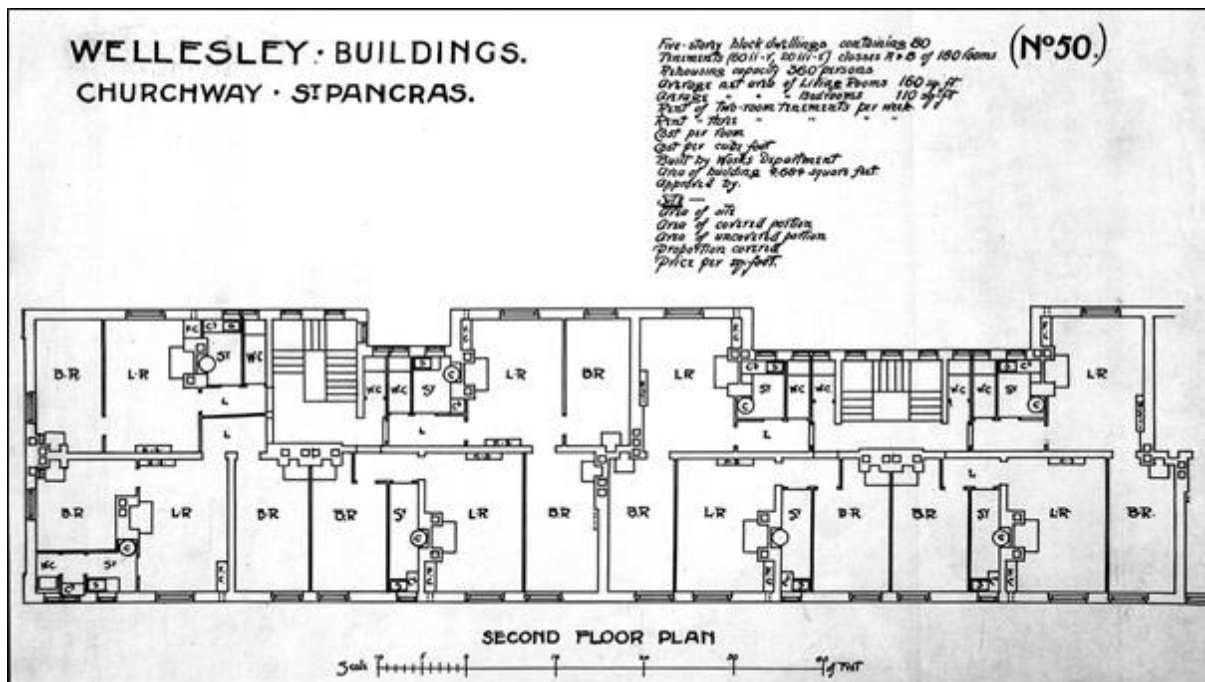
Wellesley Building floor plan (LMA ref: LCC/AR/HS/03/059)
